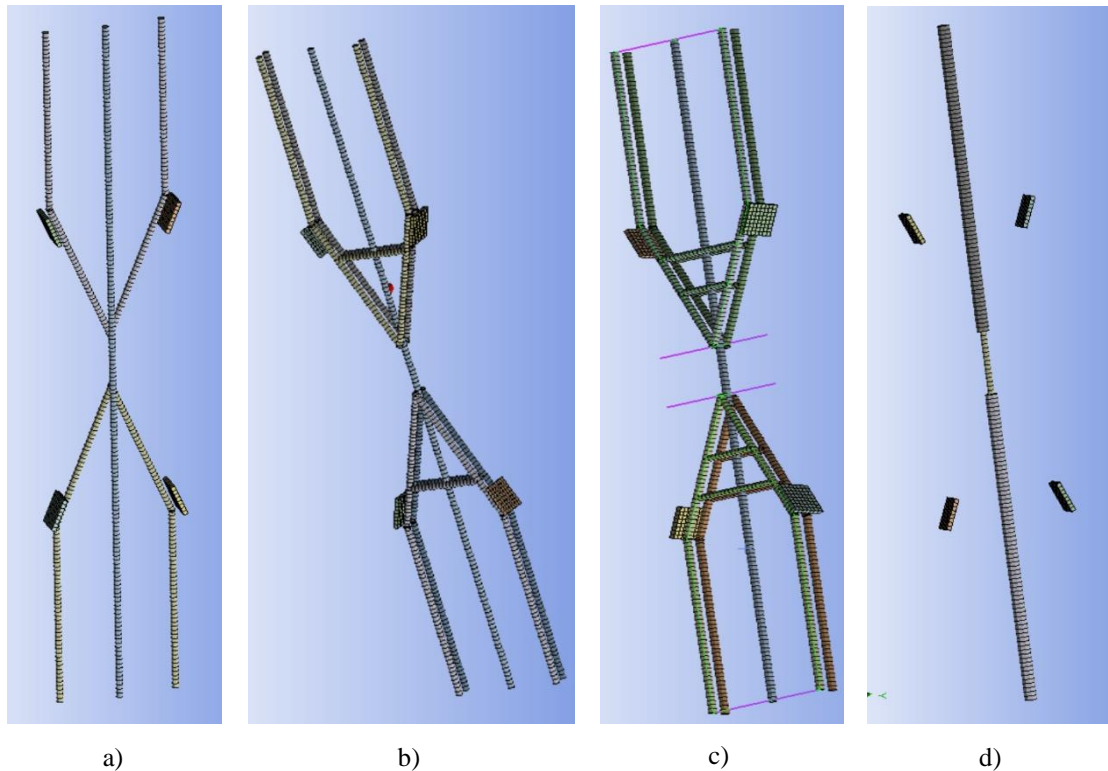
Proposed solutions for the cracking method: a) one single bar of 300 mm with 8 bars aligned according to the specimen geometry; b) one single bar of 300 mm with 16 bars aligned according to the specimen geometry and 4 transversal reinforcing bars; c) one single bar of 300 mm with 16 bars aligned according to the specimen geometry and 8 transversal reinforcing bars; d) one single bar of 300 mm of 6 mm of diameter and a reduction to 3 mm in the center.
